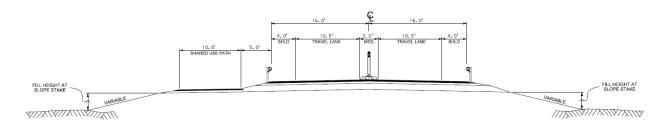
South Avenue Typical Section with Center Island Narrowing
